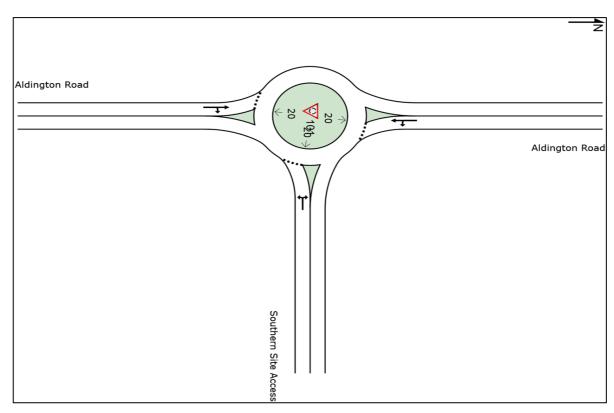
Aldington Road / Southern Site Access 2026 Intersection Layout
